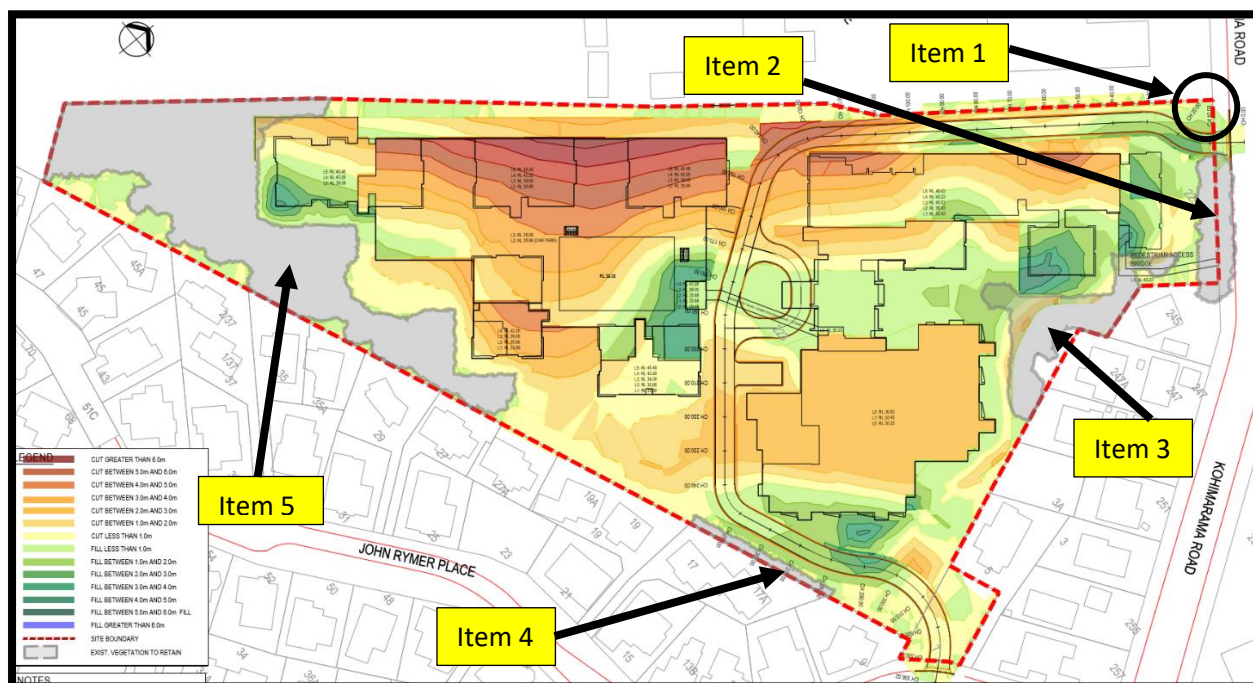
Landscape Master Plan showing areas of vegetation to be retained.
